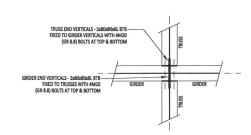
TYPICAL TRUSS TO COLUMN CONNECTION
